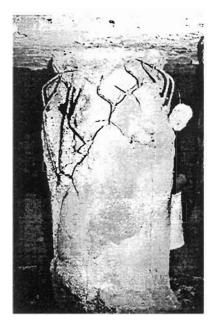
Damaged pile foundation due to soil liquefaction (photo by Prof. K. Tokimatsu)
